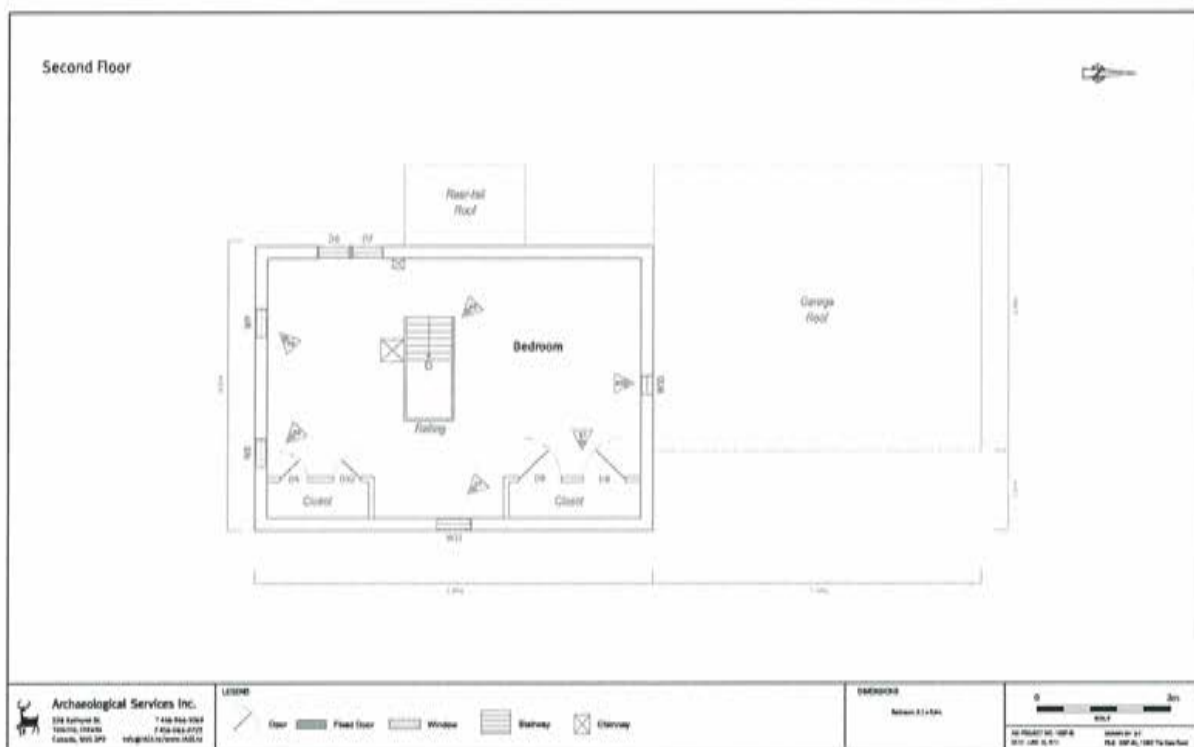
Interior floor plan of upper storey showing overall dimensional measurements of residential exterior and internal rooms.
